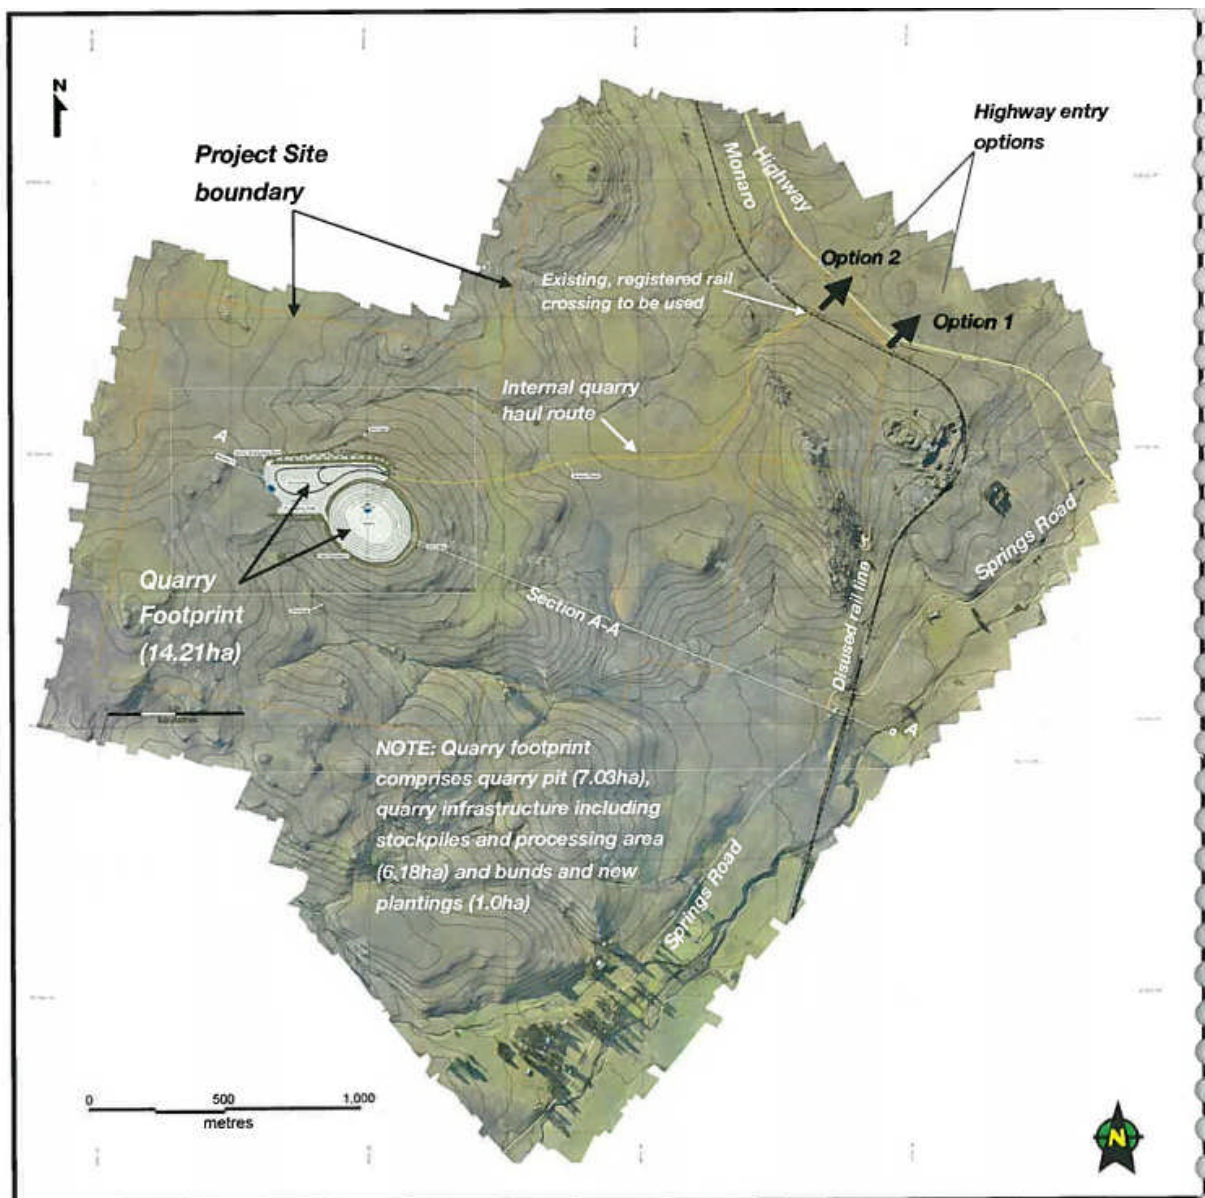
the project site as proposed in the Environmental Impact Statement (EIS)
